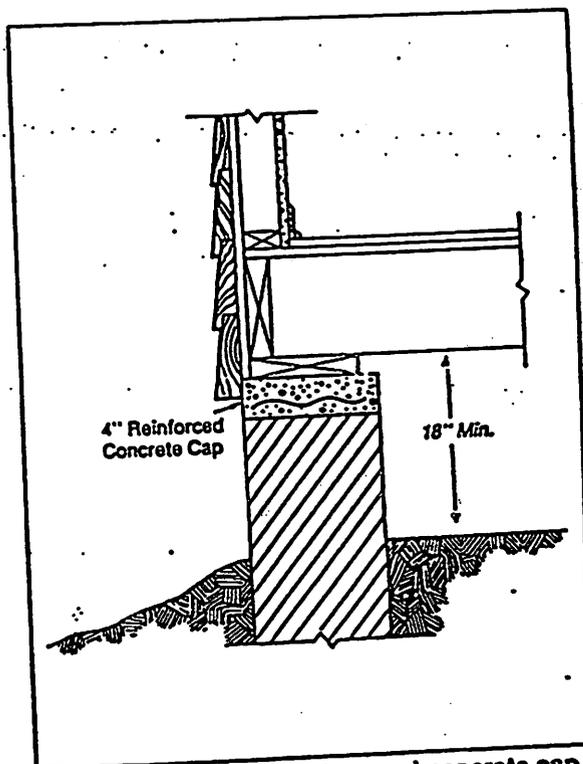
A reinforced poured-concrete cap on masonry walls or piers prevents hidden attack by termites. A minimum of four inches (10 cm) should be provided between the outside finished grade and the lower horizontal joint of the cap; also, a clearance of six inches (15 cm) from wood to the ground should be provided. Minimum clearance of 18 inches (46 cm) under the floor joists will allow inspection for the presence of termite tubes or for possible cracking of the cap. Adapted from USDA.
